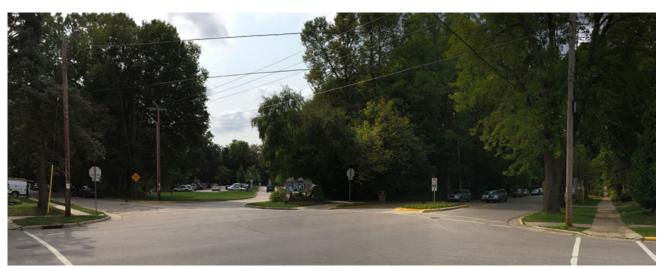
Existing Intersection of Drake Street and Randall Avenue
